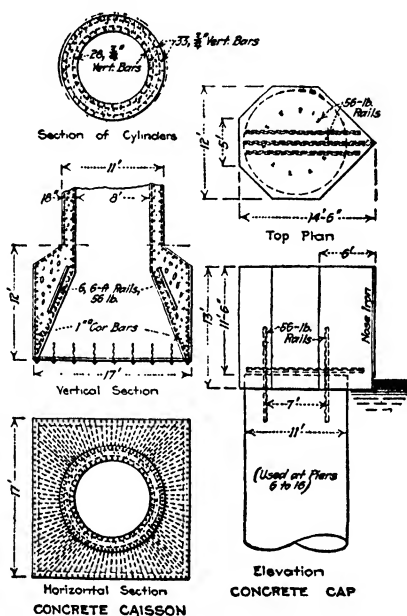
Reinforced-concrete Cylinder Caisson.
